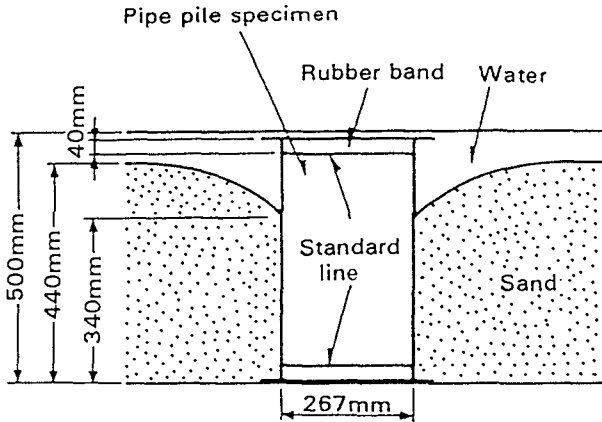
Profile of the sand bed around the pipe pile specimen.
